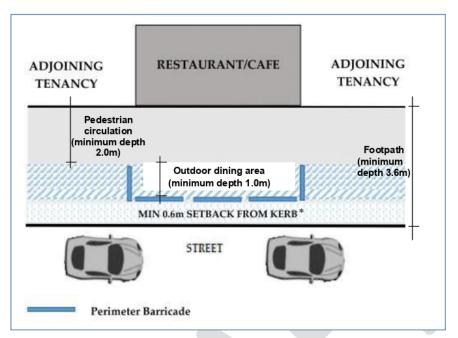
Minimum dimensions for outdoor dining on primary retail streets adjoining car parking
